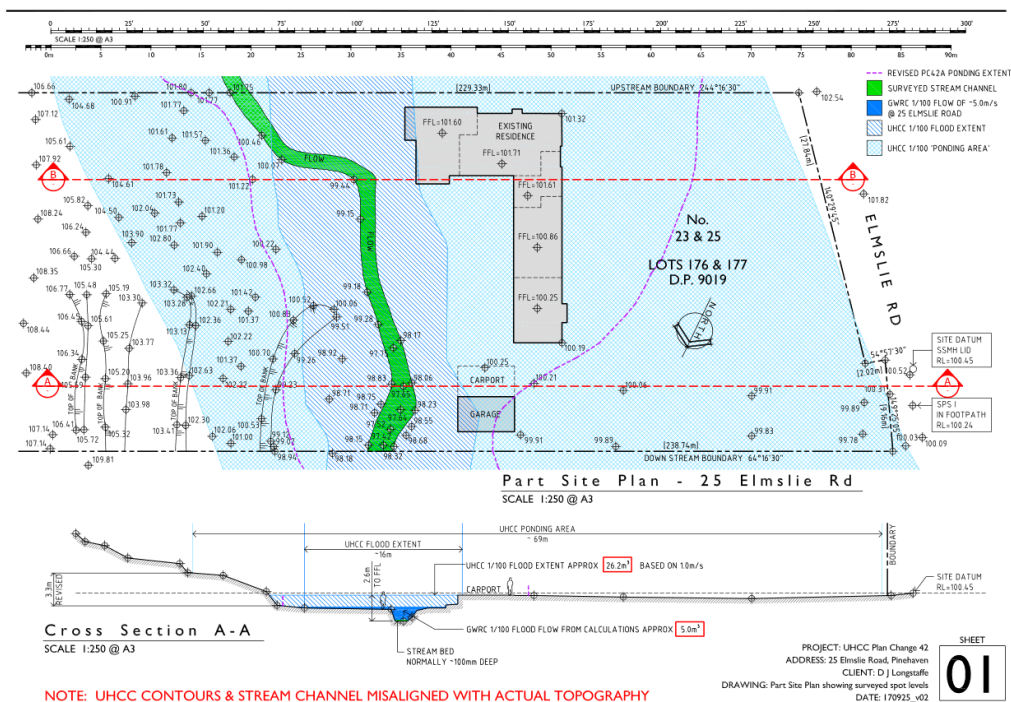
Site Plan and cross section for 25 Elmslie Road.
